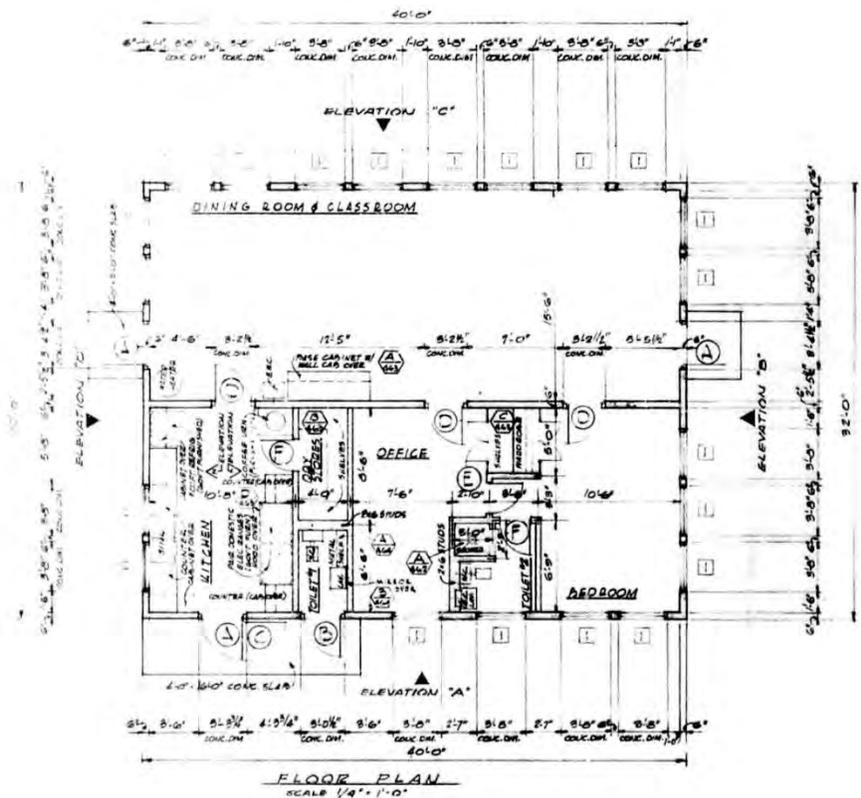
As Built plan view of Features 77, 78, 133, 134, 135 and 136, Training Buildings
